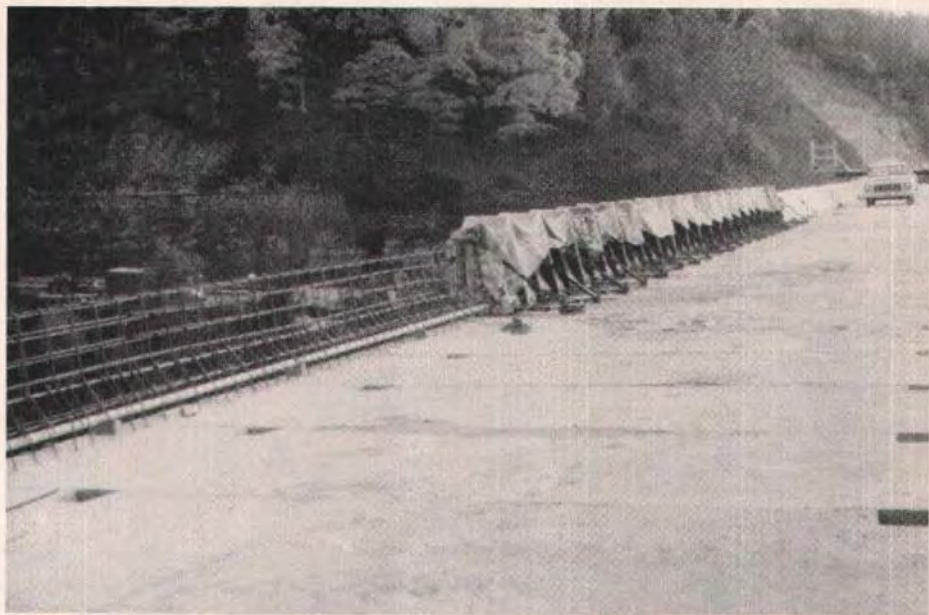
The barrier walls were formed and cast in place in the late fall of 1979.
